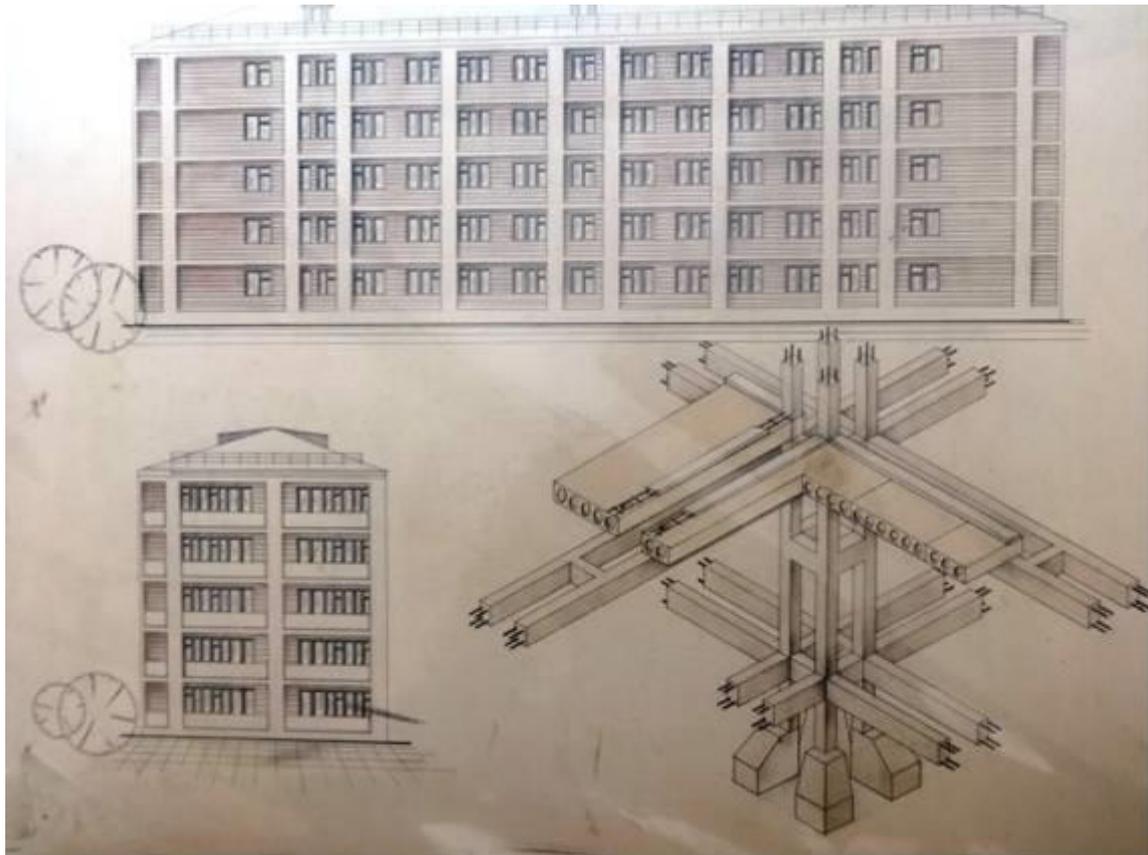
The strengthening version for stone buildings (ТЕПАРМ-90)
